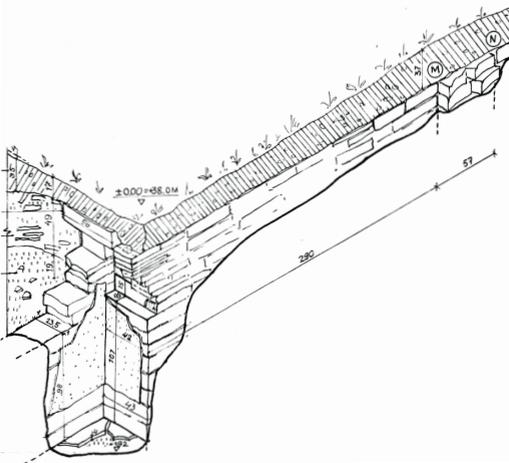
A wall discovered in 1986 near the former coach washing pond, with remains of a partition wall, a niche and a limestone floor.
